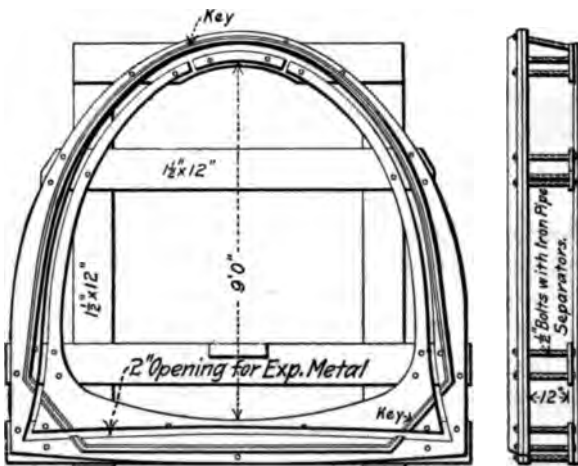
Bulkhead Form, Torresdale Conduits.
